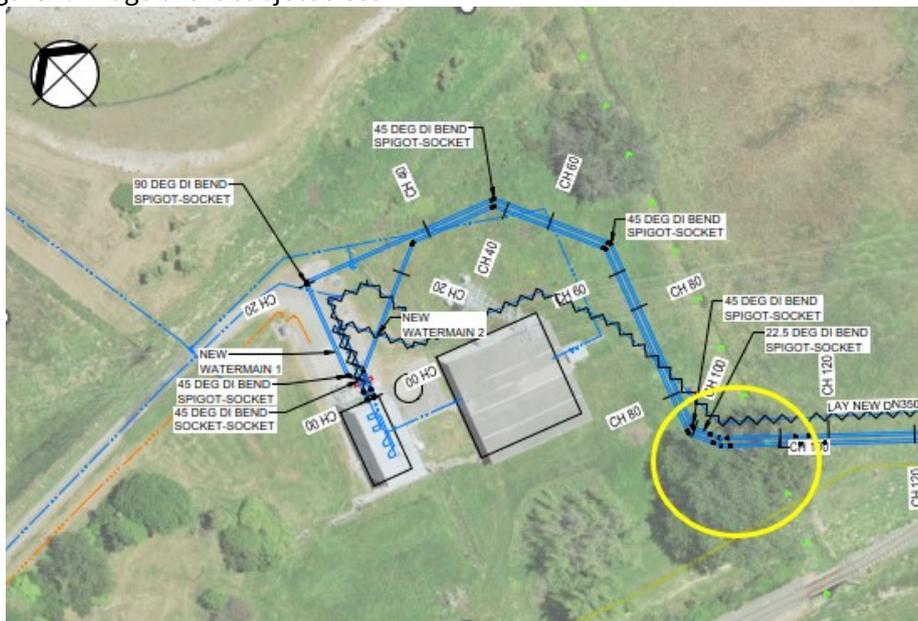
Showing location of the trees and alignment of the pipe on the construction plan.
